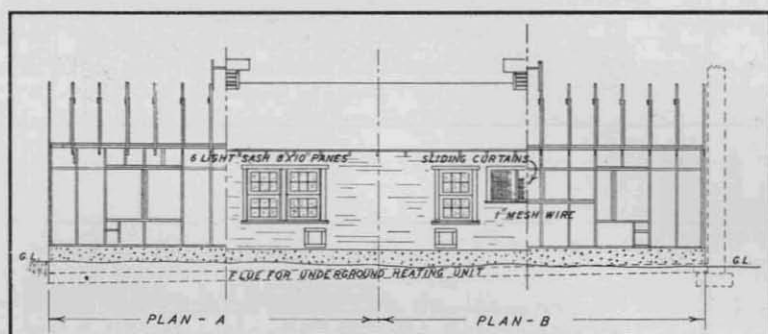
Front elevation of the gable ceiling insulated laying house.
